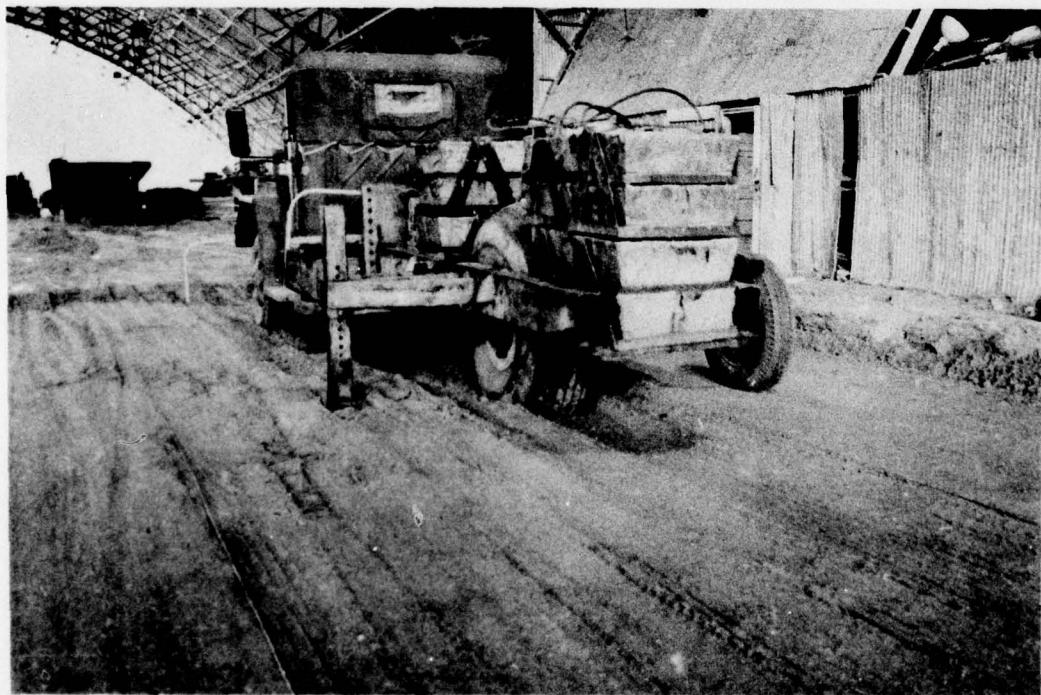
Test Section No. 1, item 2, with 10 in. of gravel
